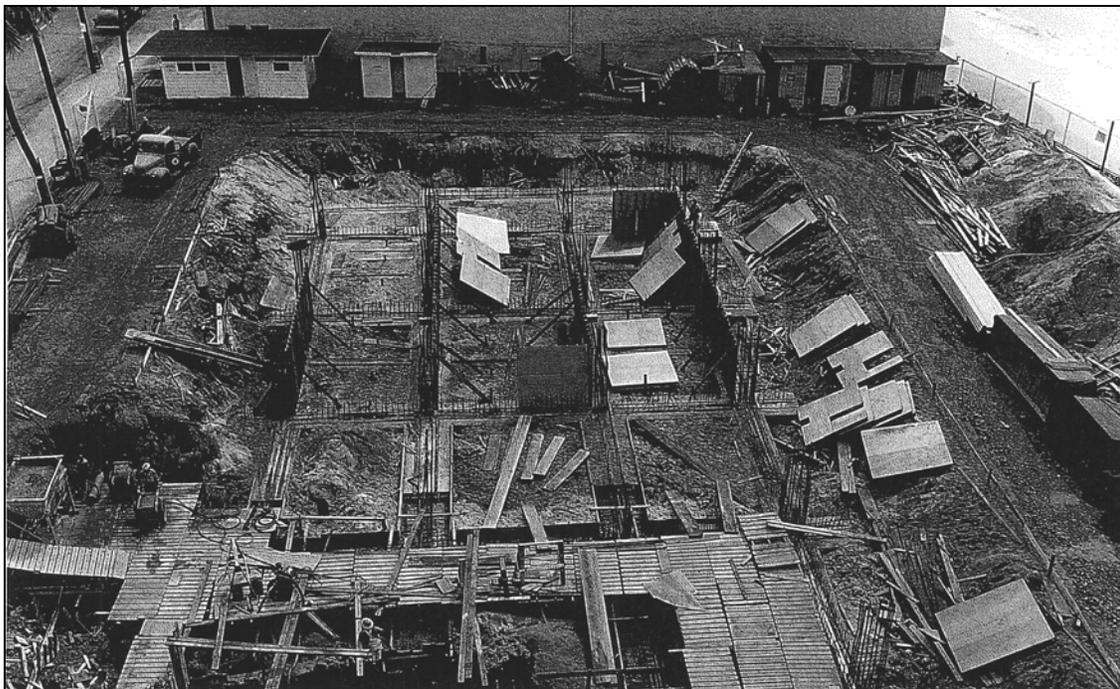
View of Diamond Head Tower basement under construction in 1950 (Kalākaua Ave. at left, seawall at right, Waikīkī bowling alley in background; note workers for scale)
